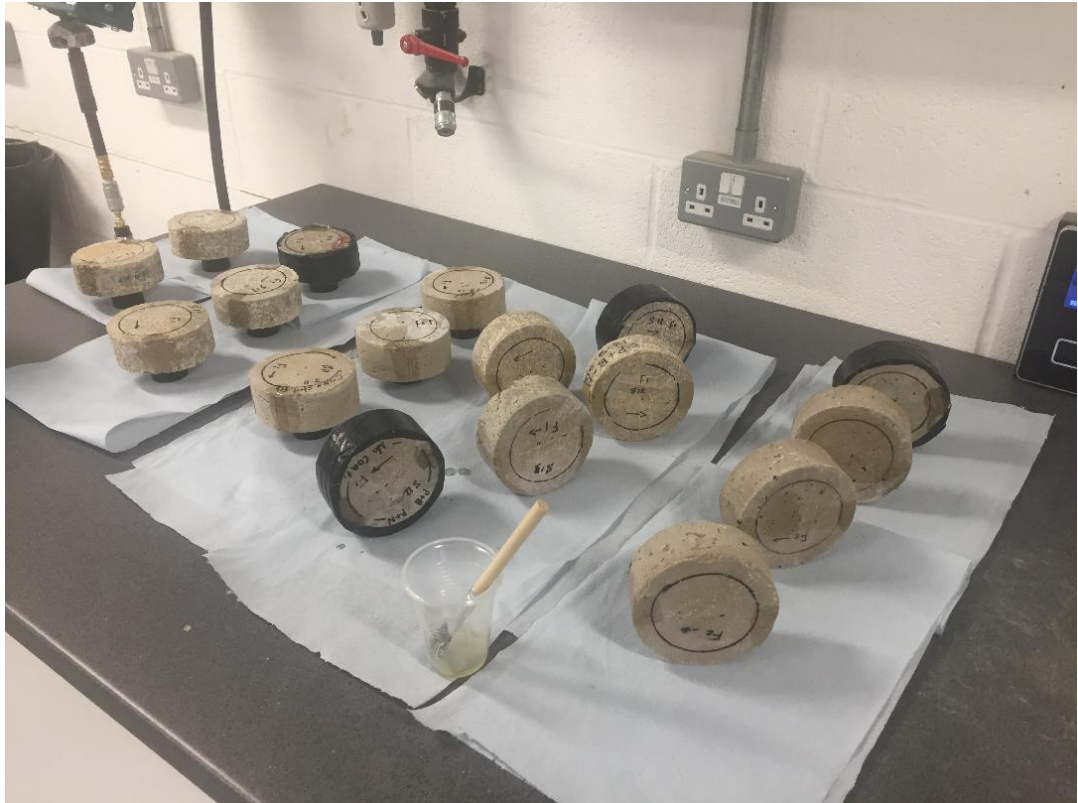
Coating the extended cracks by fast-hardener epoxy
